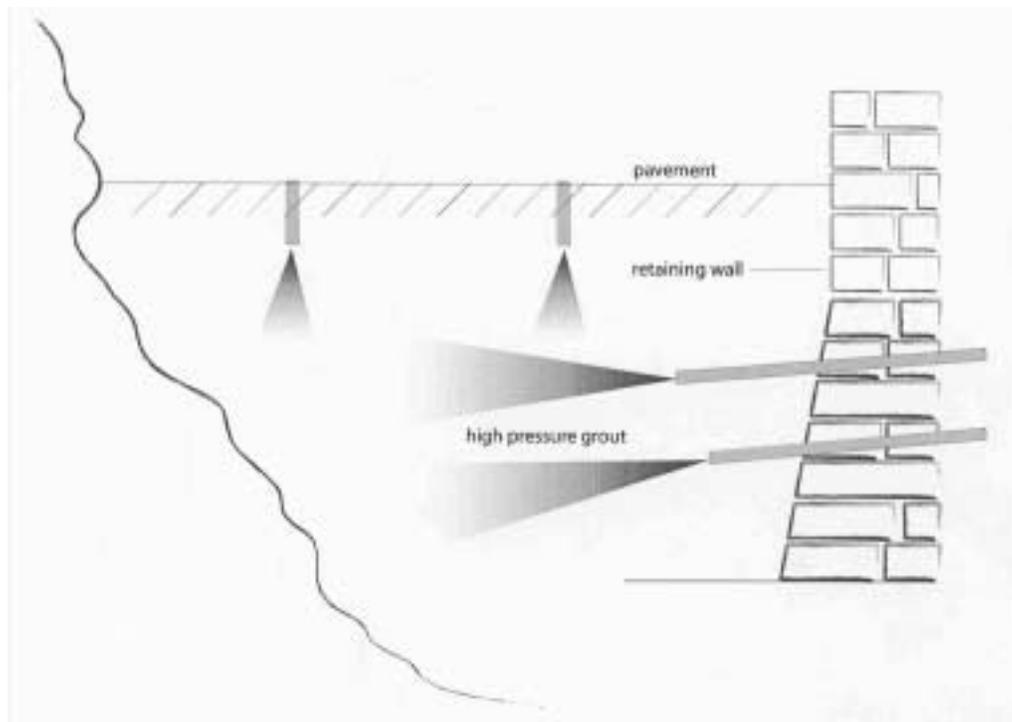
Repairing a retaining wall by injecting grout to stabilize the road base
